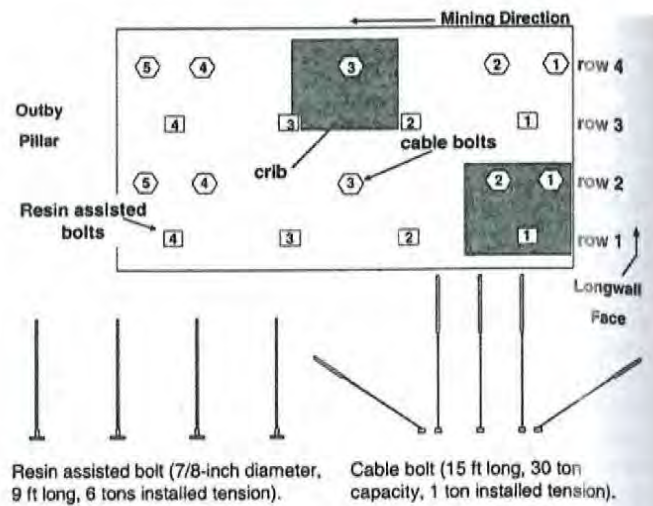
Plan view of the bolt locations and cross section of the applied bolting systems.
